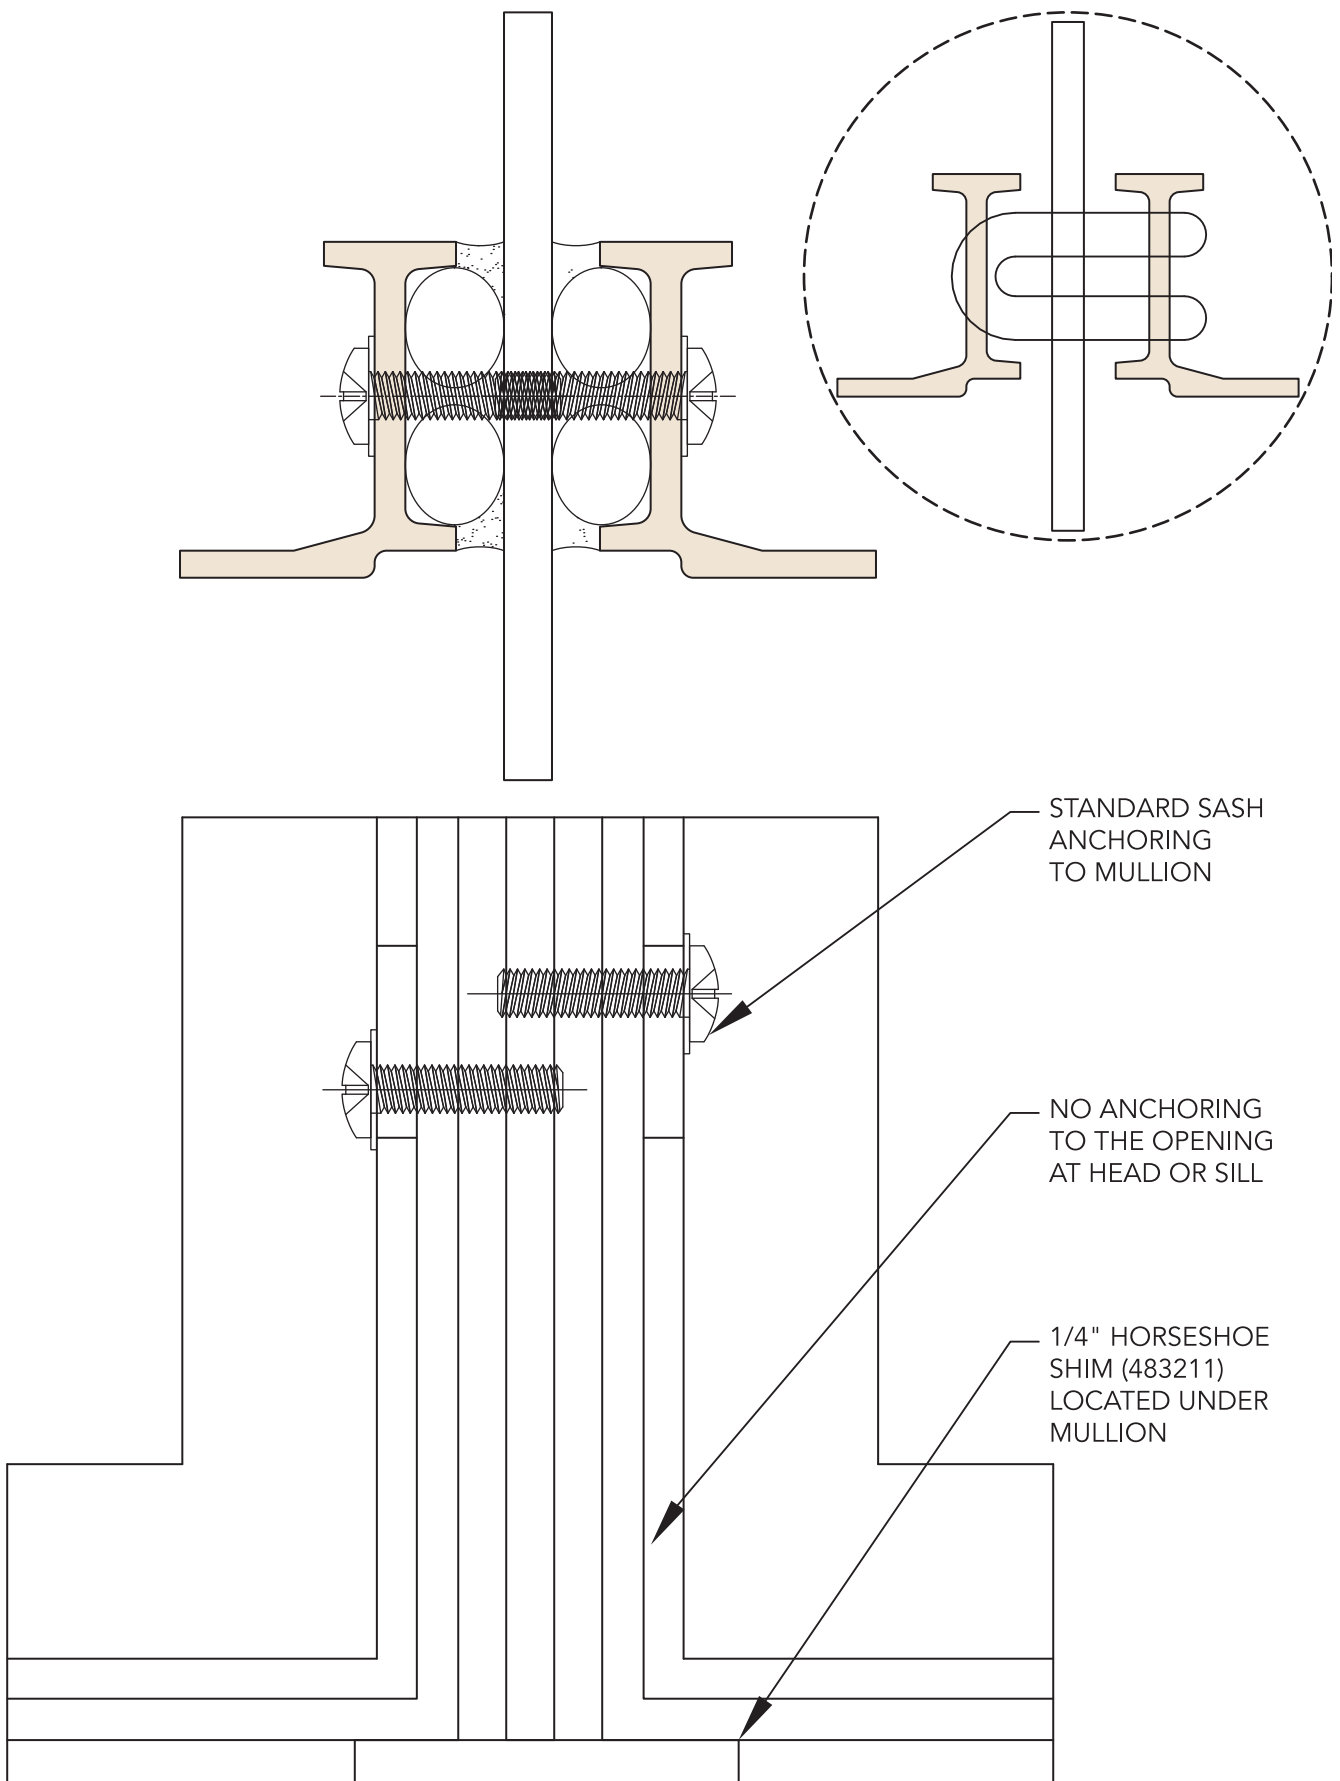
NON-STRUCTURAL MULLION ANCHOR
